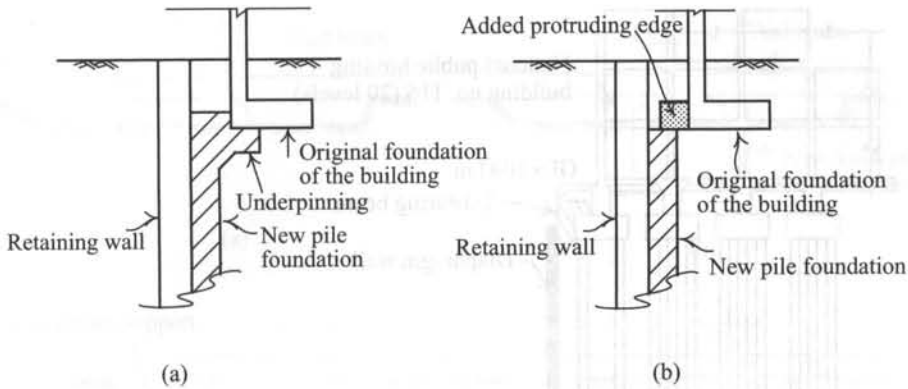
Underpinning an existing building: (a) constructing a bracket and foundation piles and (b) constructing an extra protruding edge and foundation piles.
